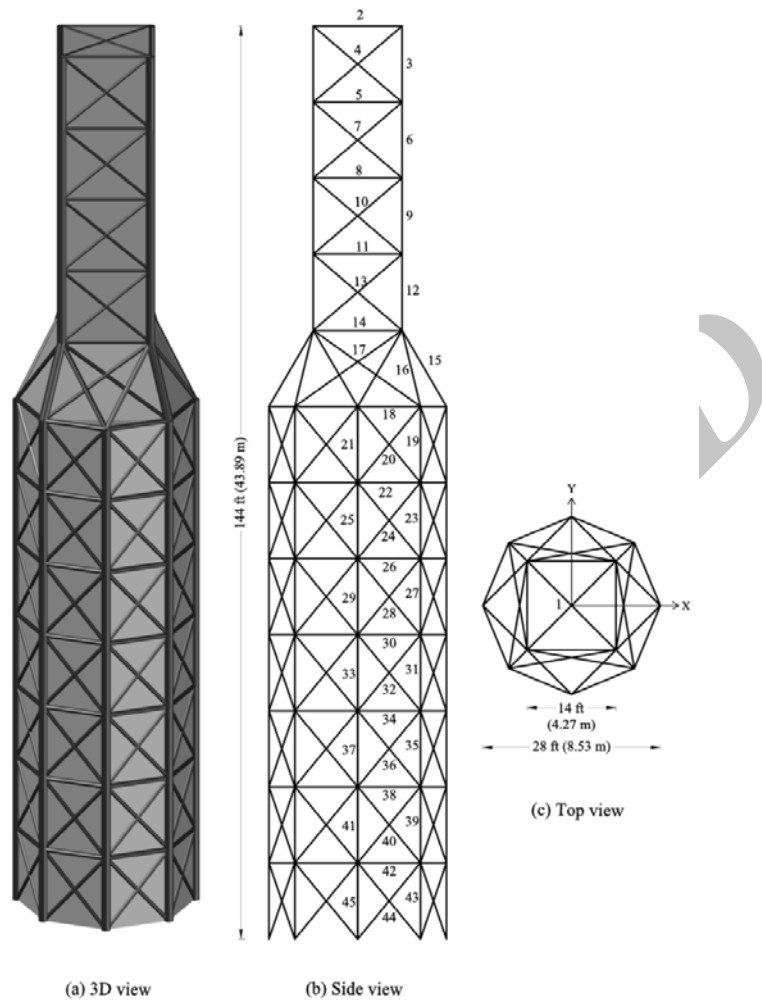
A twelve story truss tower: geometry and member grouping [25].
